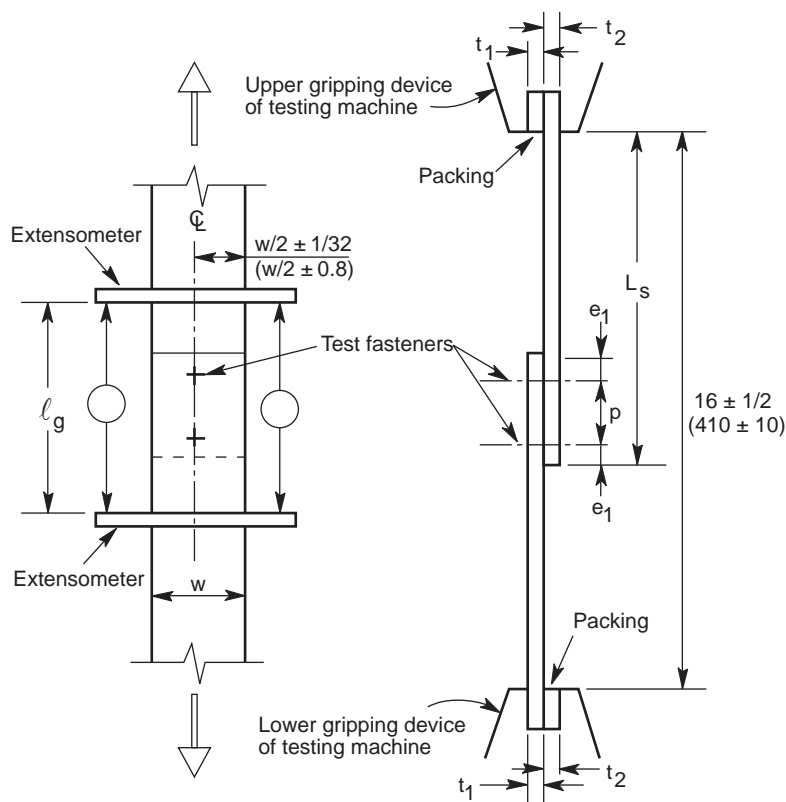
Standard Lap-Joint Shear Test, units – in. (mm)
